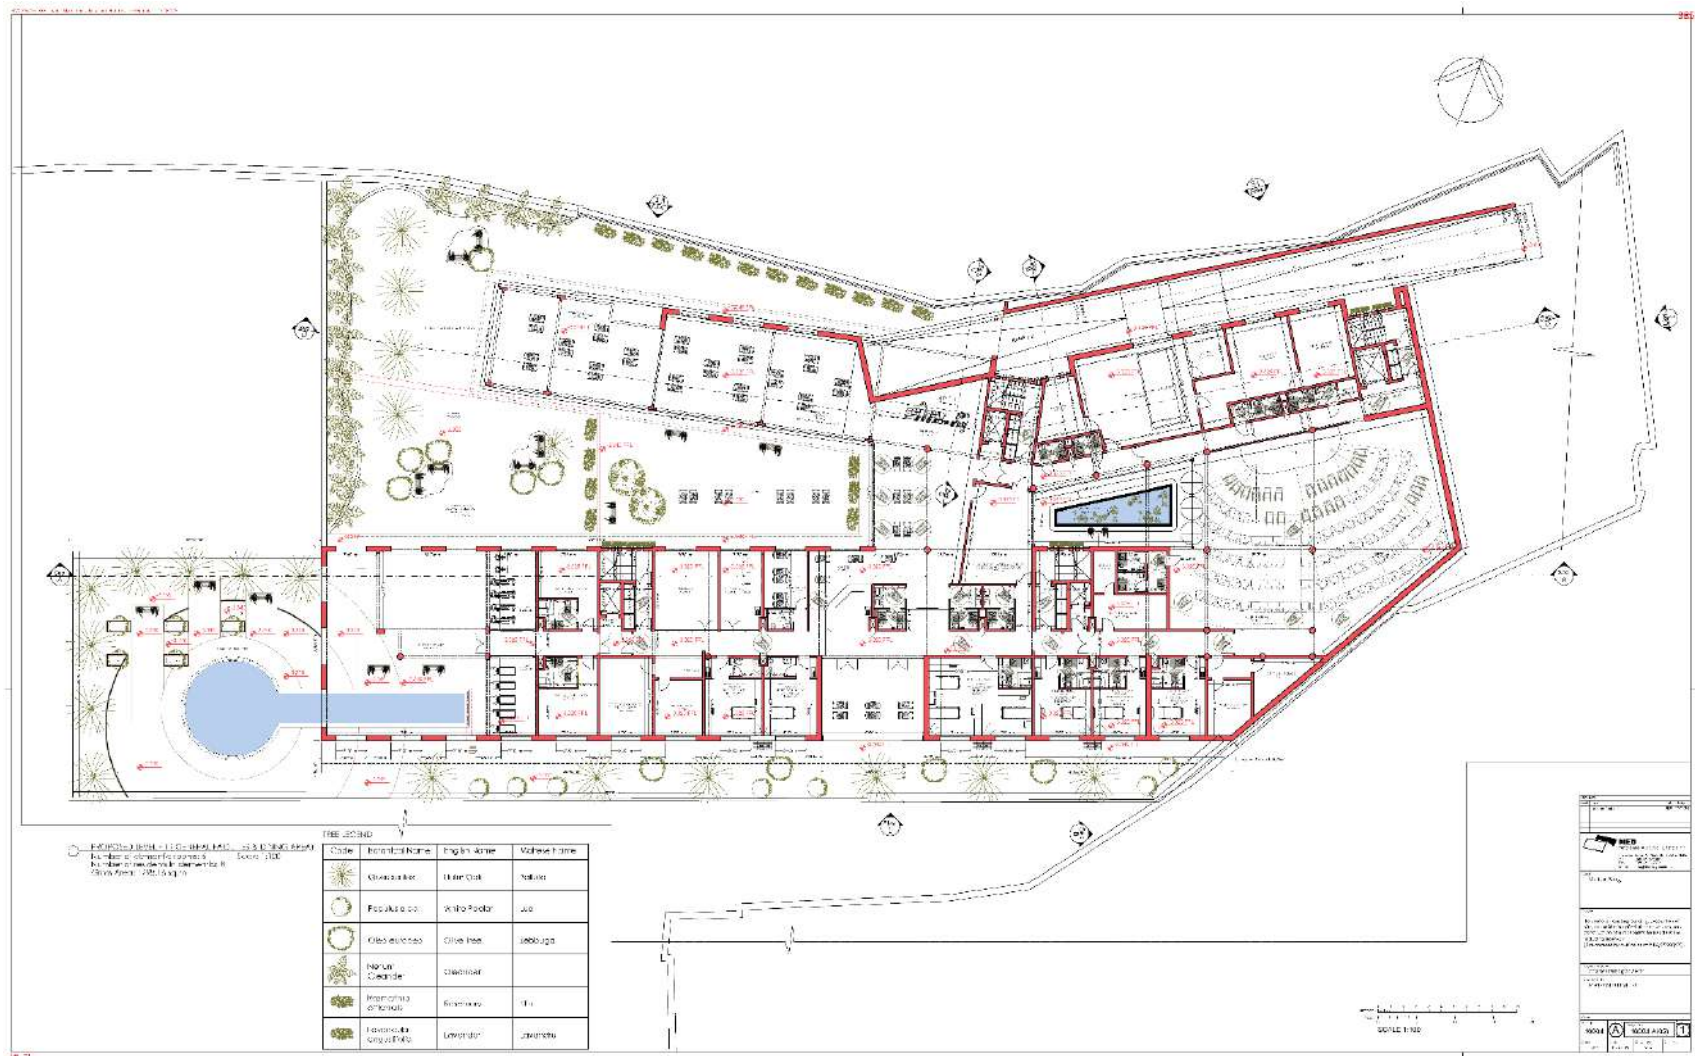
LANDSCAPING PLAN FOR LEVEL -1 WITHIN THE PROPOSED DEVELOPMENT FOOTPRINT
